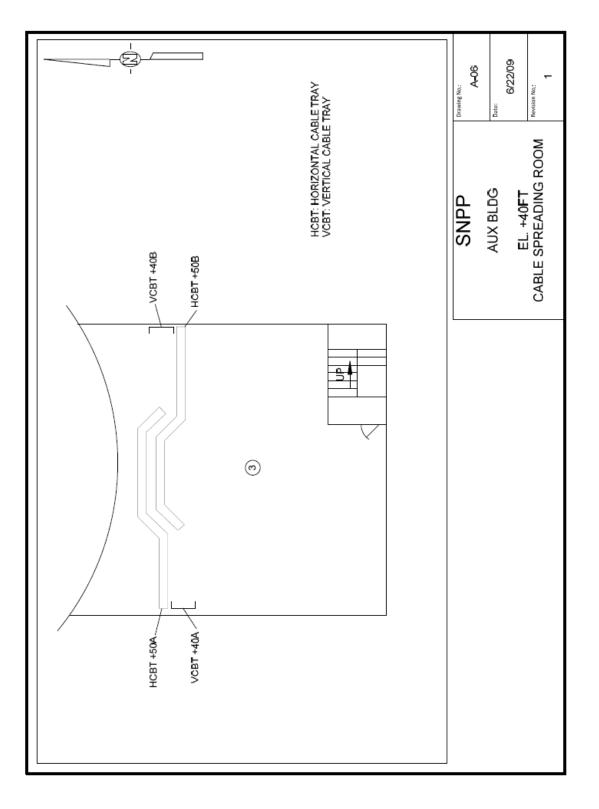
Auxiliary Building – Elevation +40 Ft.
